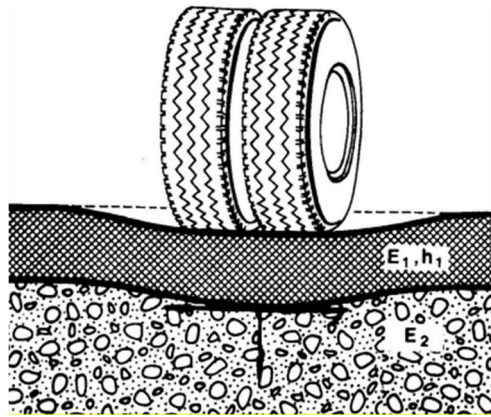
Scheme of mechanical behavior of flexible pavement structure under traffic load [6]
